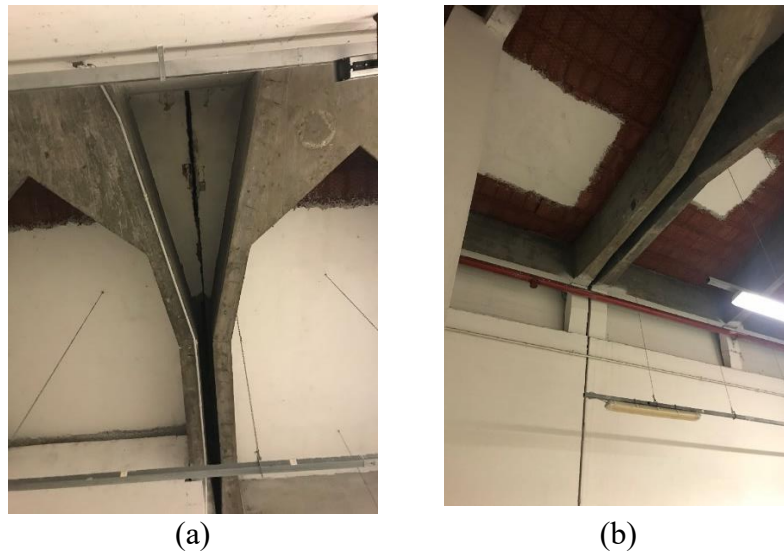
Details of the expansion joint: (a) between the roof and the ribs; (b) between the shorter strut beams and the retaining walls
